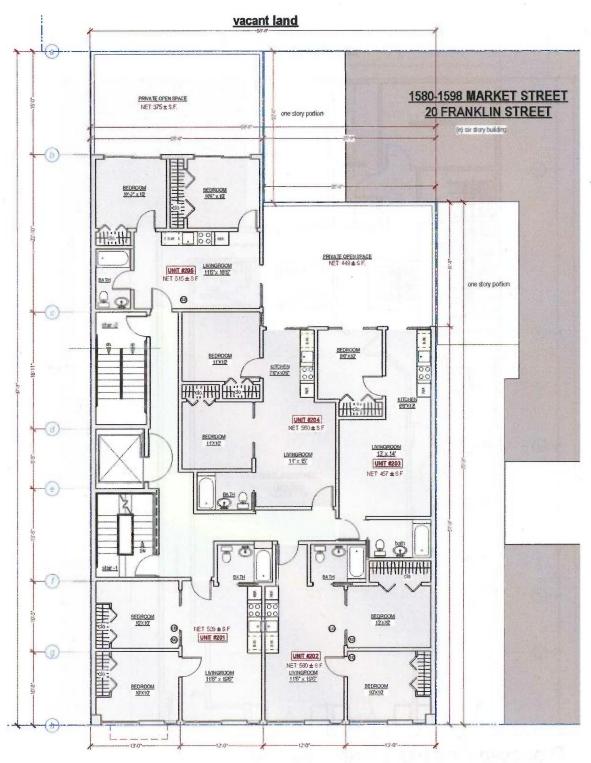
PROPOSED FIRST FLOOR PLAN
